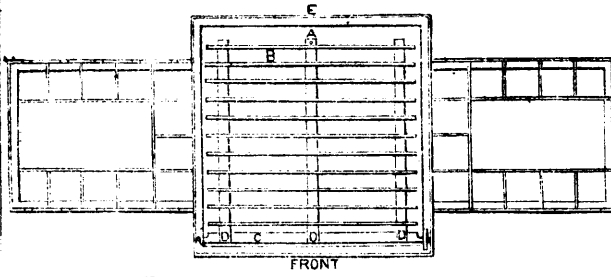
GROUND PLAN OF POULTRY HOUSE.
